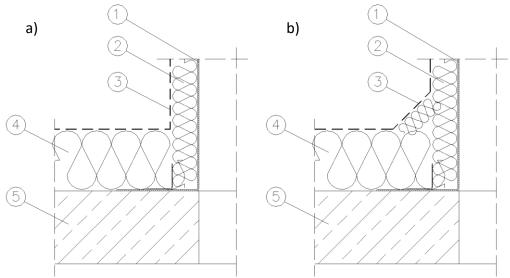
ITEM B: Standard base on reinforced concrete slab (a - PVC membrane, b - roofing paper).
